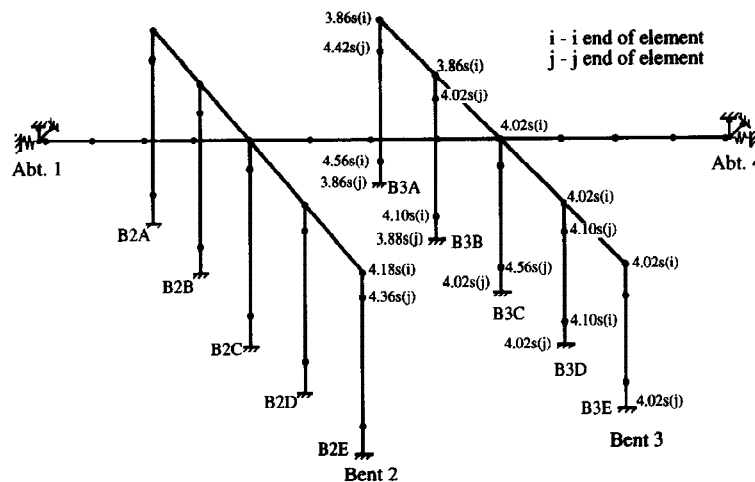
Yielding pattern of Bull Creek Canyon Channel bridge's right structure
